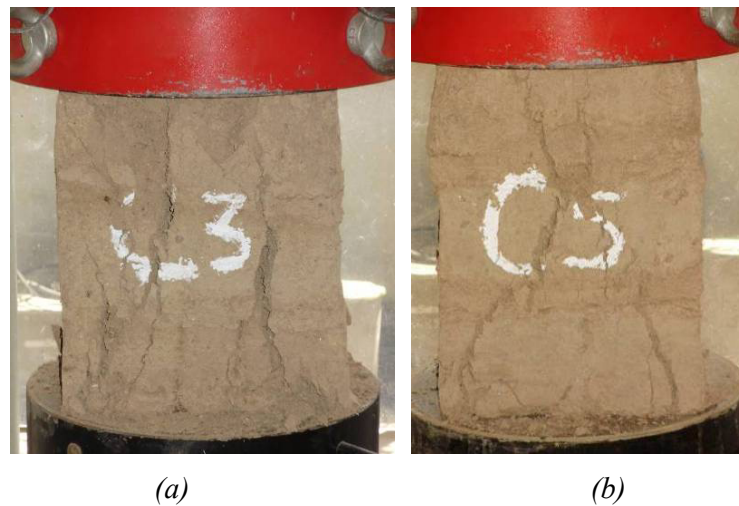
Types of failure pattern of compression prisms (specimen C3 & C5).
